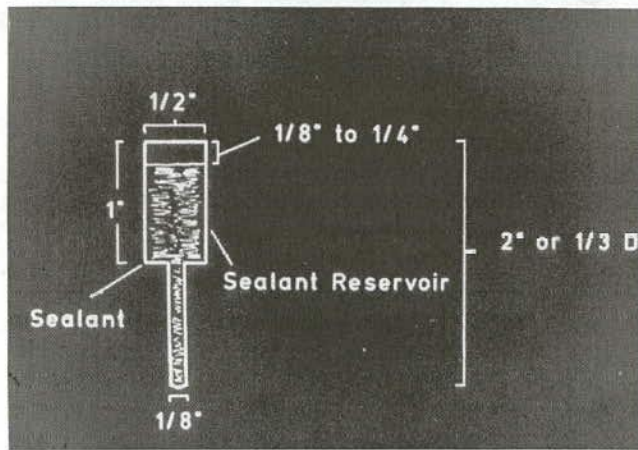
Construction standard for saw and seal bituminous overlays of rigid pavements.
